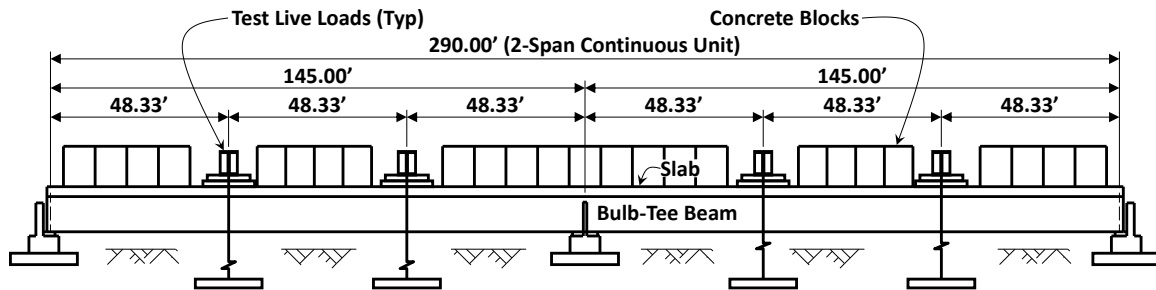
Elevation view of prototype girder line (adapted from Garcia, 1993)
